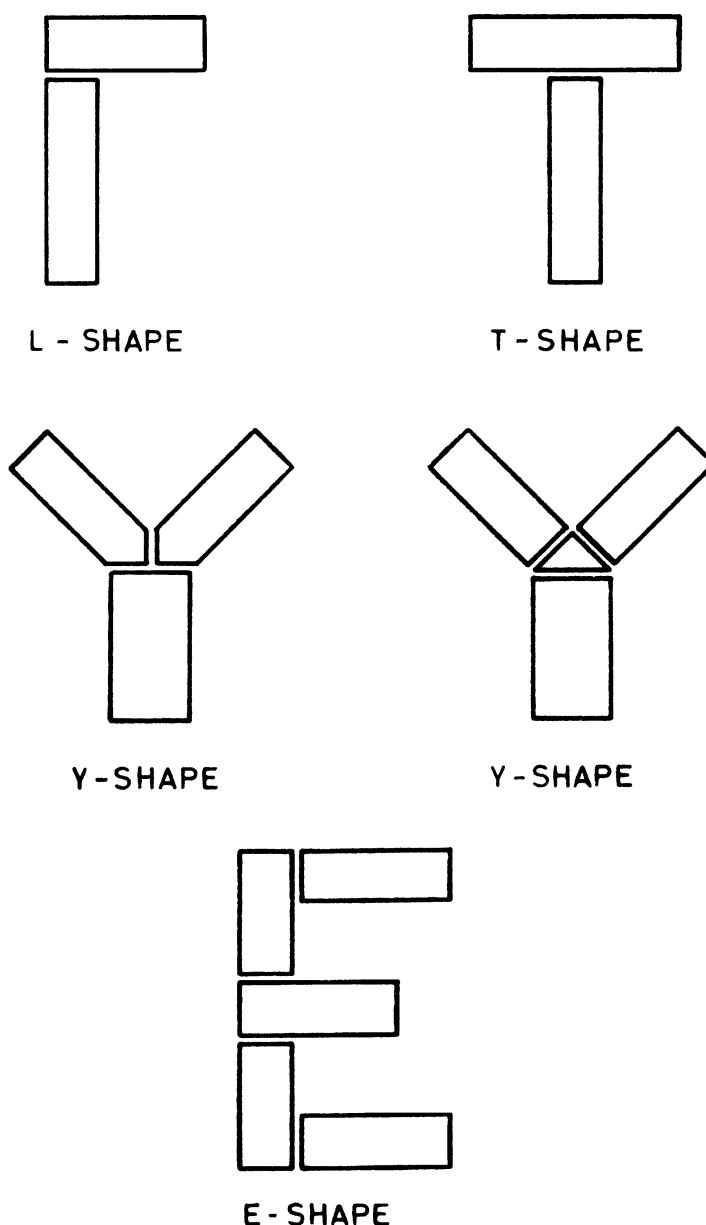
TYPICAL SHAPES OF BUILDING WITH SEPARATION SECTIONS
